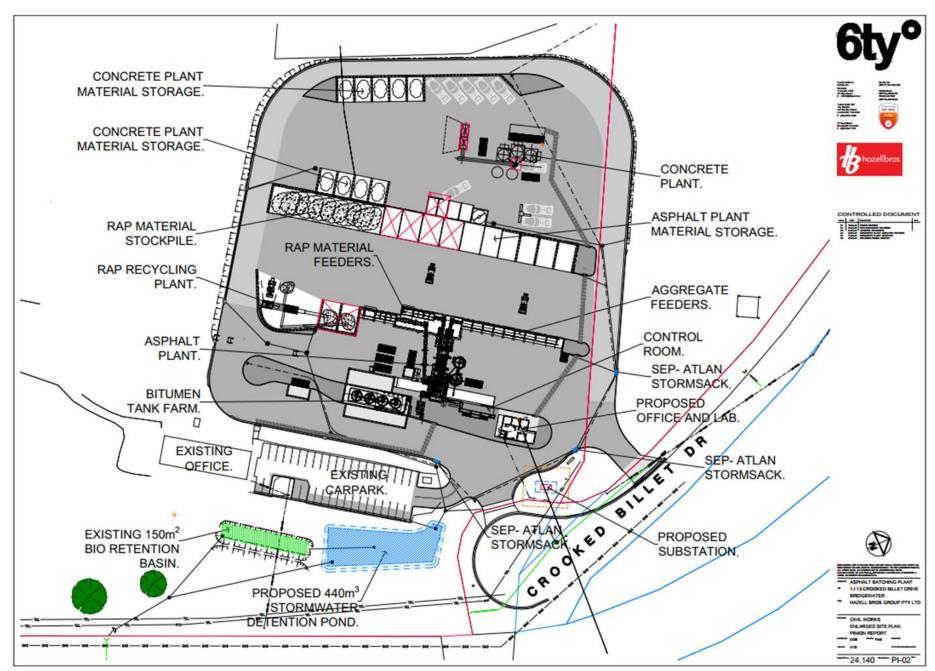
Site layout of proposed asphalt plant and relocated concrete batch plant to the west (Source: 6ty)
